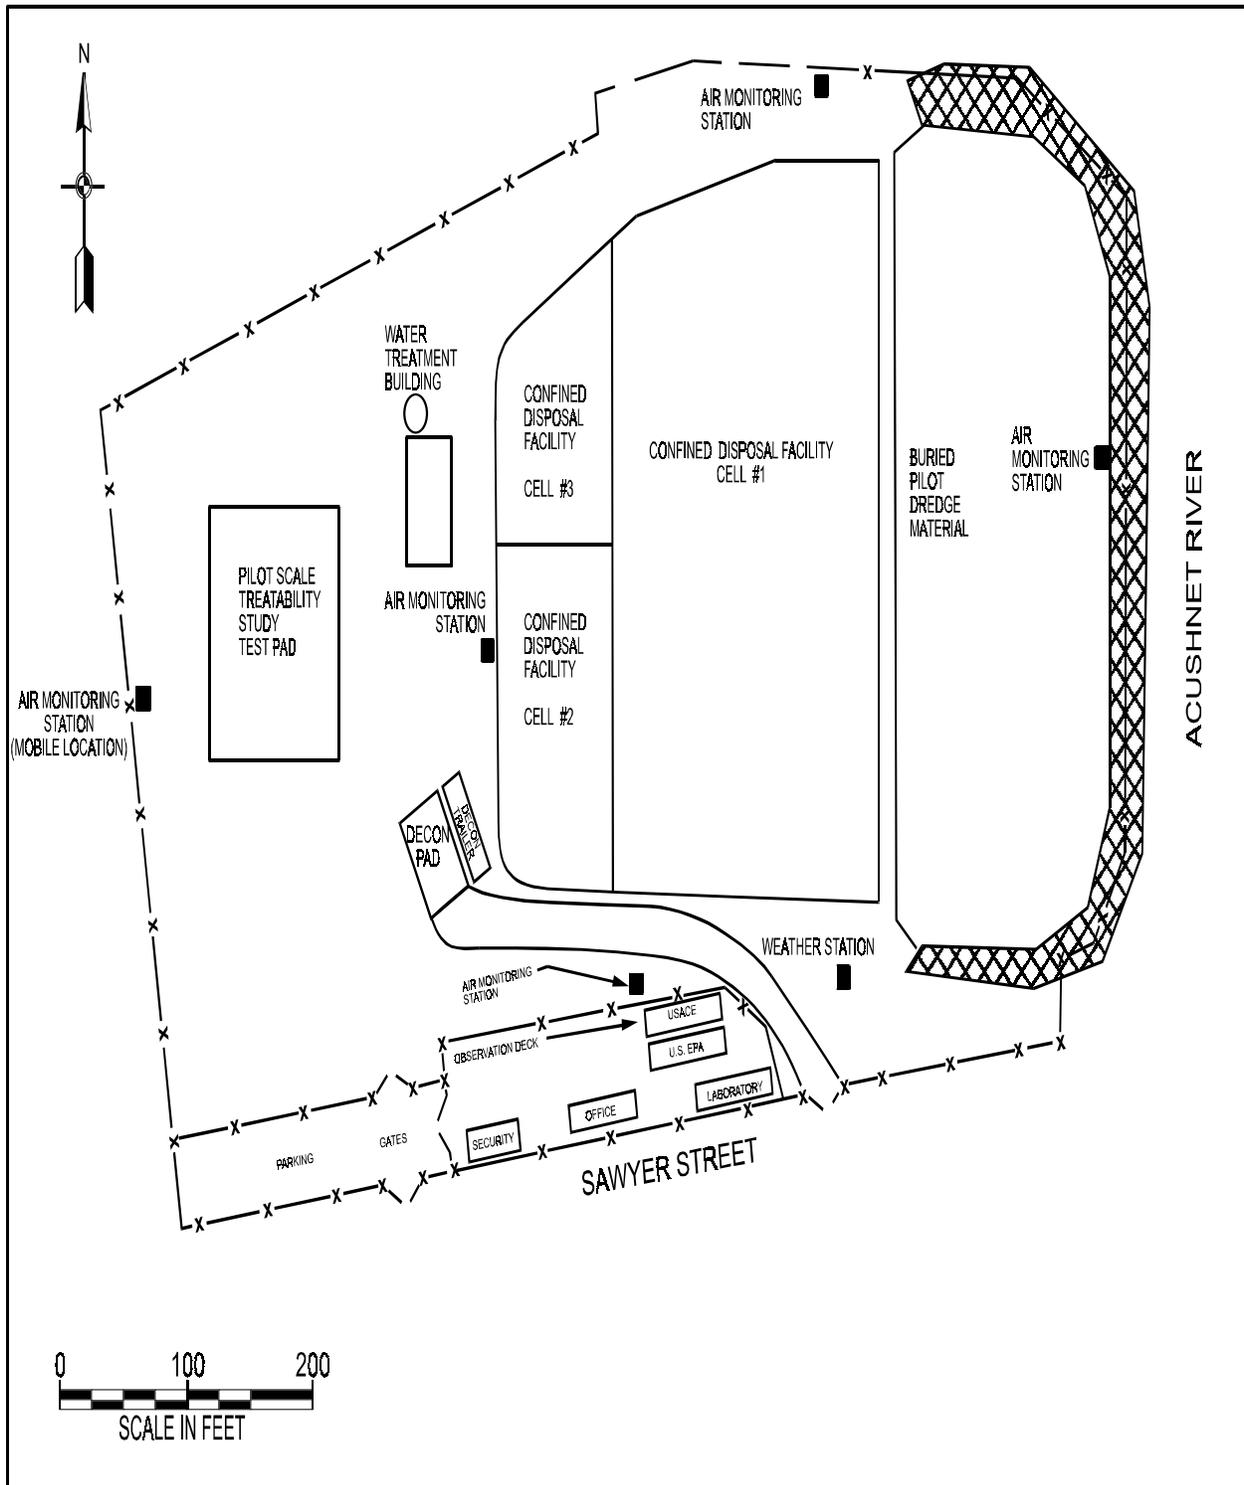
Layout of Confined Disposal Facility and Test Area [1]
